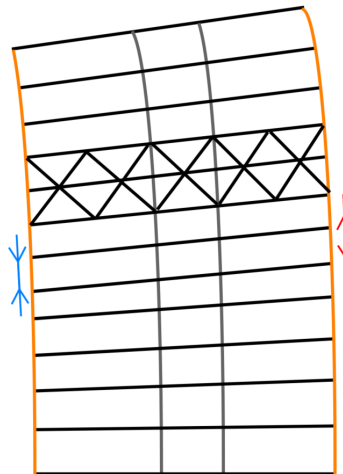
Shortening of timber columns due to wind load transfer through outrigger
